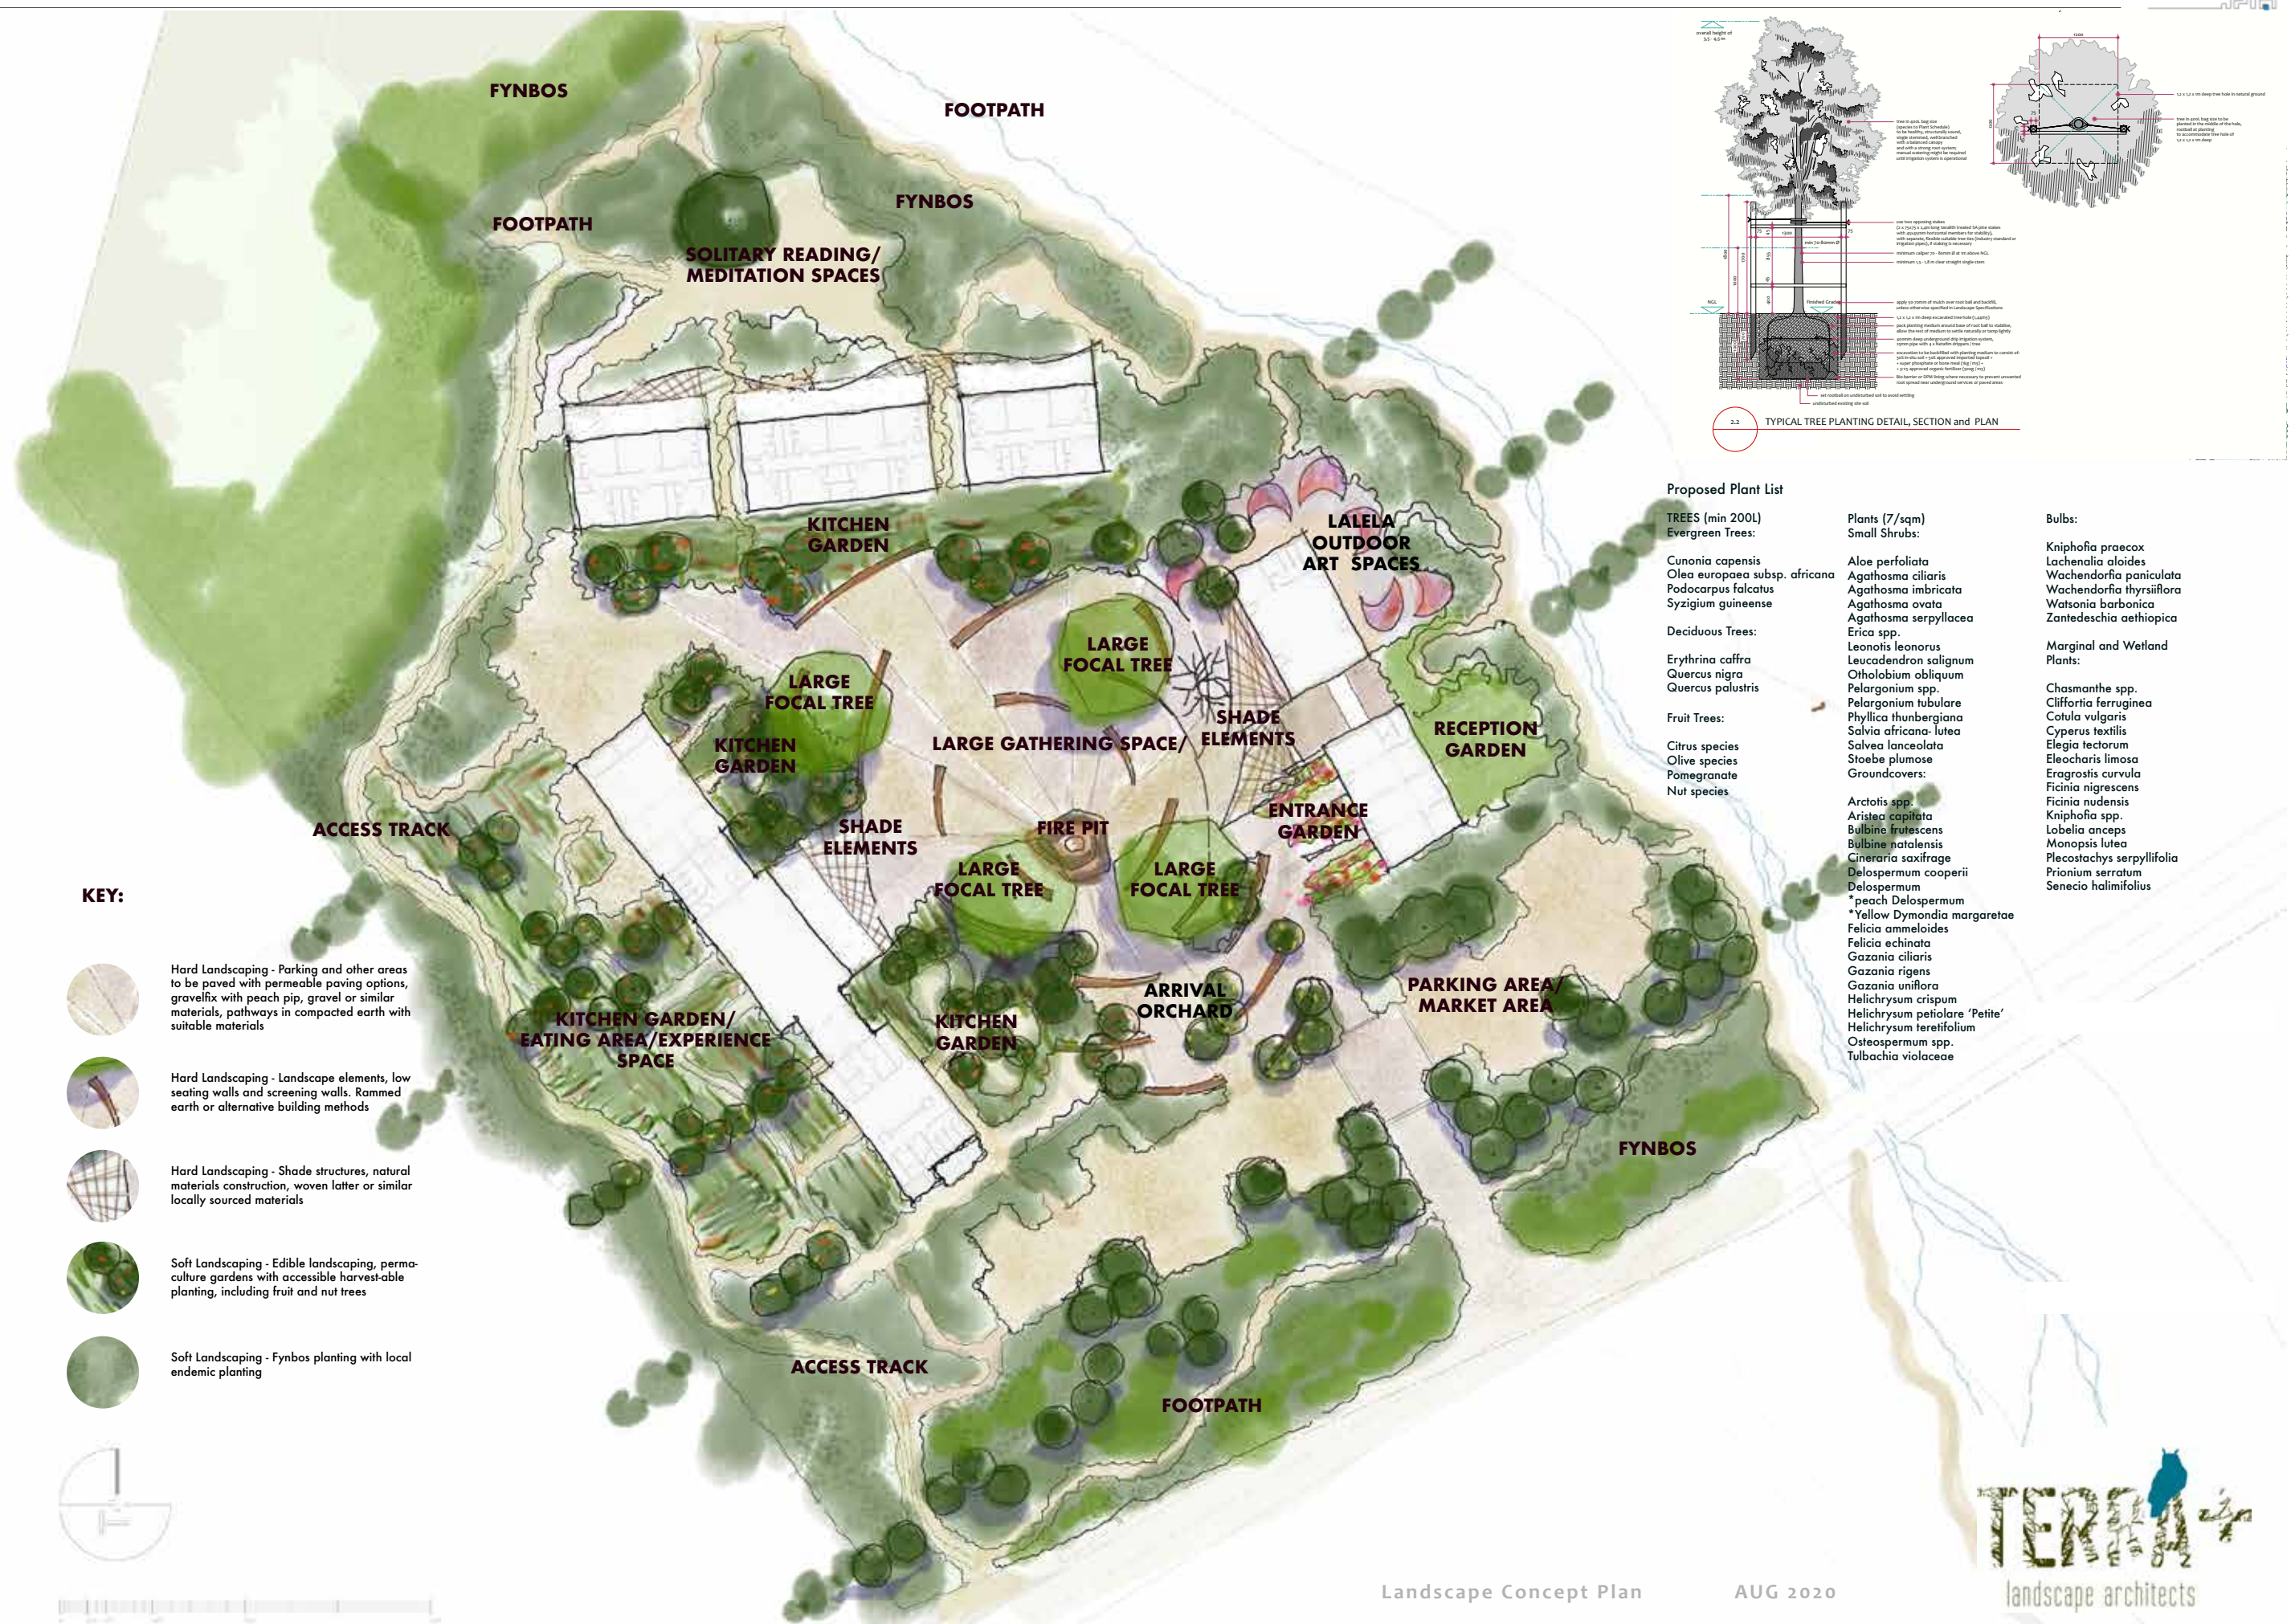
Bertha Retreat Landscape Concept Plan (Terra+ Landscape Architects, 2020)
